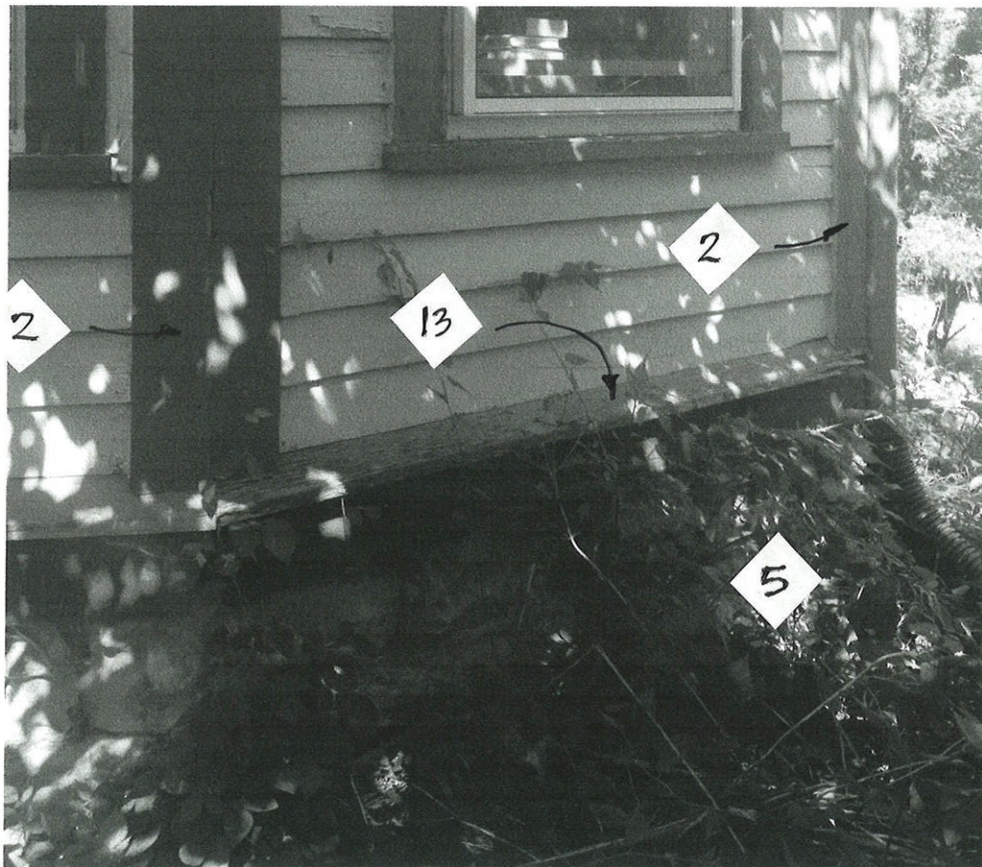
South Elevation - Main Entrance facing Rutledge St.
